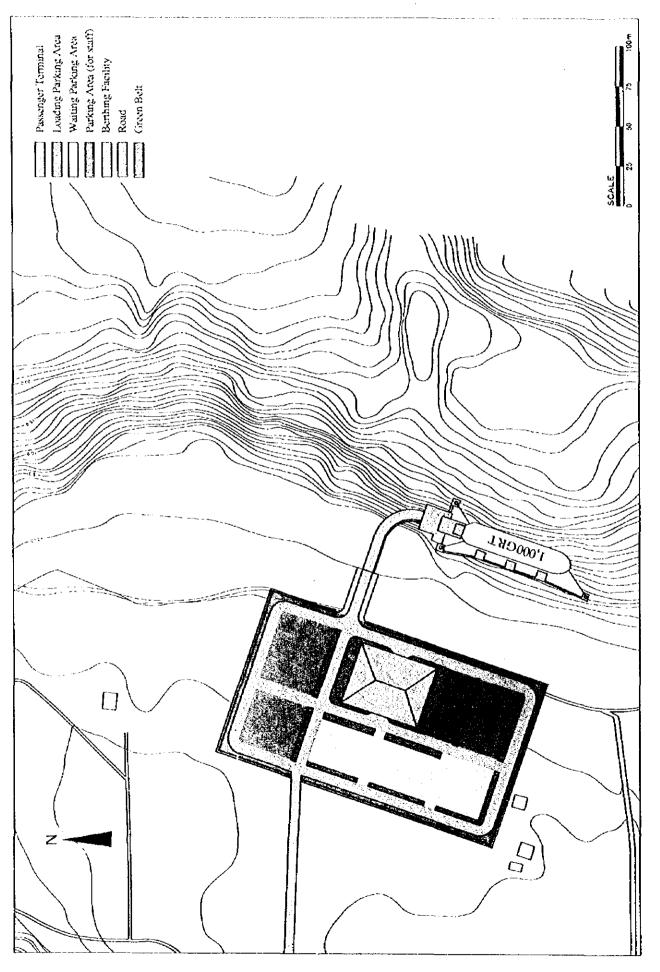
Layout Plan of Manokwari Ferry Terminal
